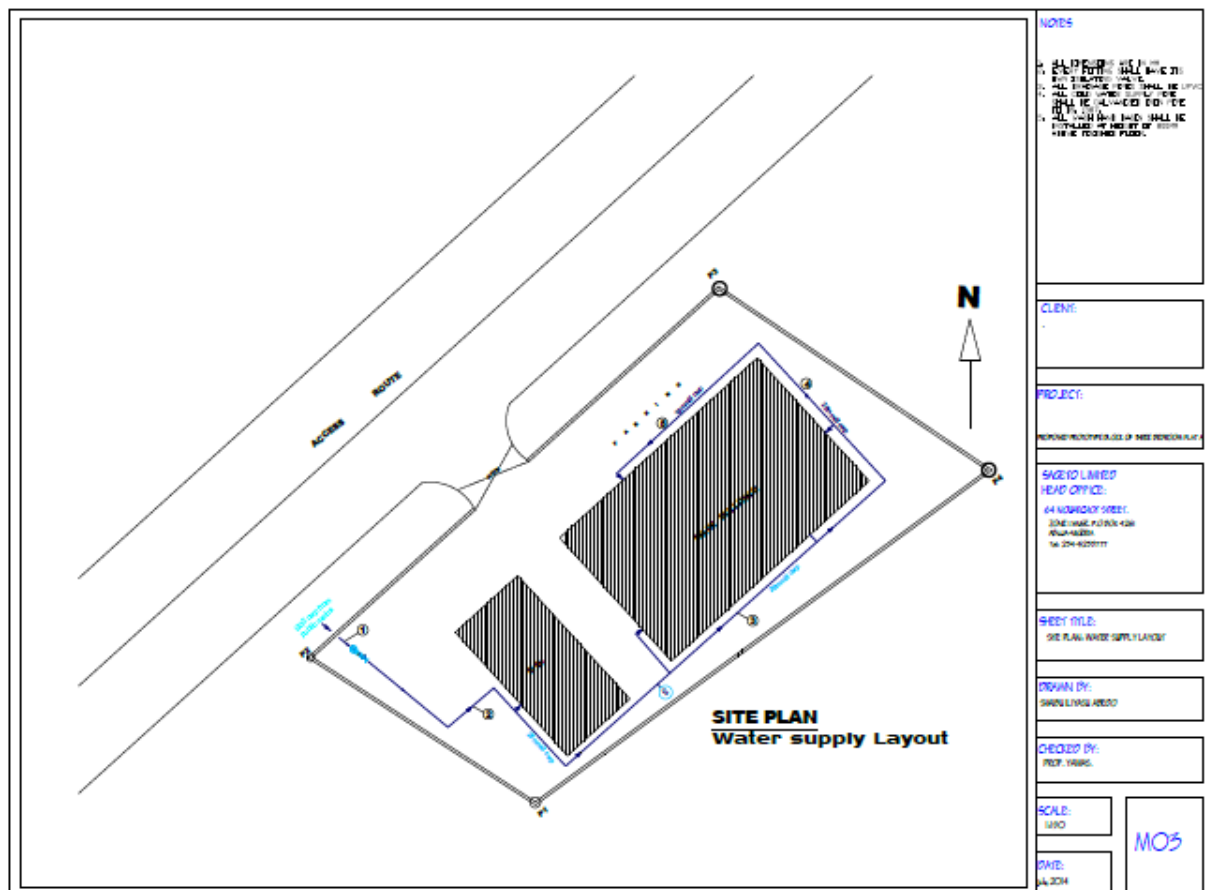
Site plan water supply layout of the three bedroom bungalow
